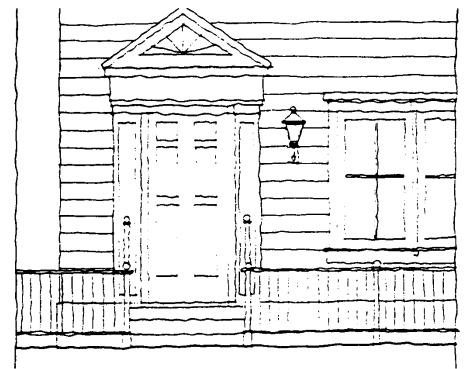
Entrances to buildings should be architecturally defined and articulated.
